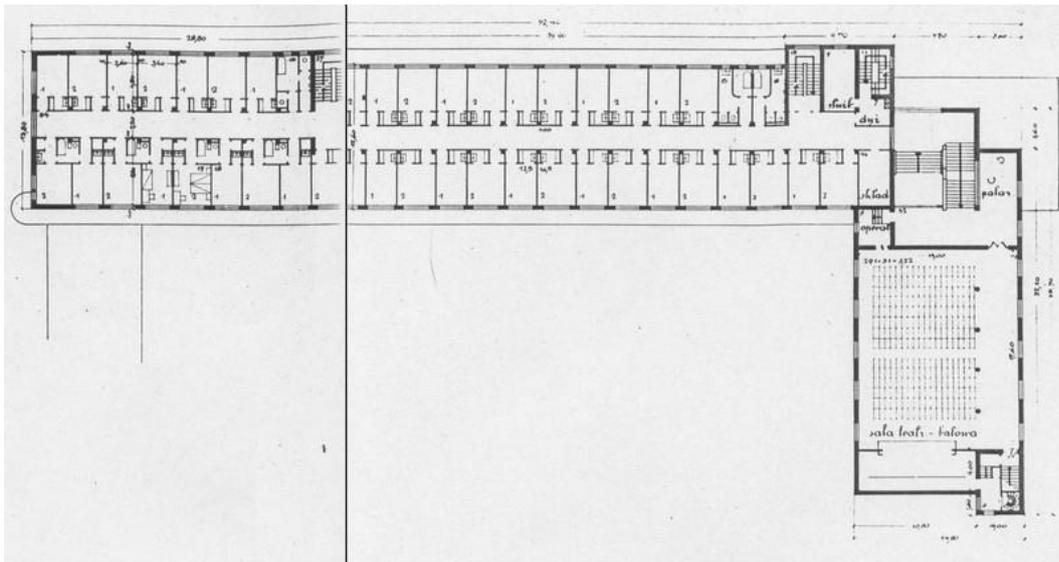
Sanatorium, ground plan of the first floor; State Archive in Gdańsk.
